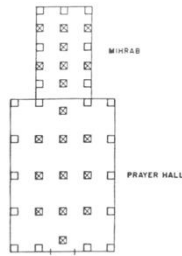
Surau Aur, Ground Plan, Tiang and Tongkat Arrangement.
